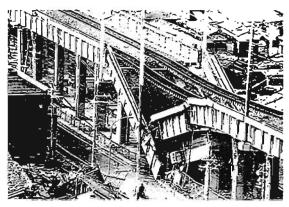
Shinkansen Bullet Train Line near Nishinomiya:as Plate 6.6, but photo by authors
